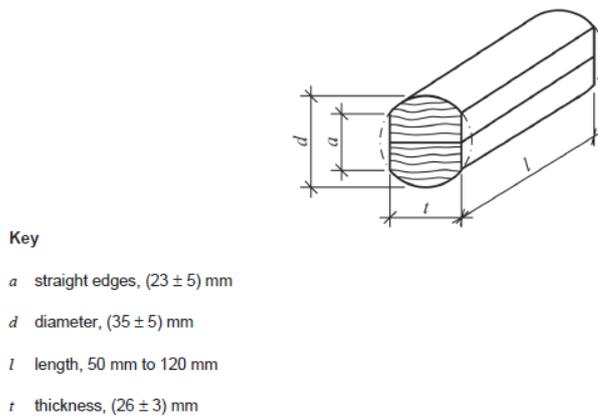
Drill core with machine parallel plane surfaces, figure D.3 from NS-EN 14080
